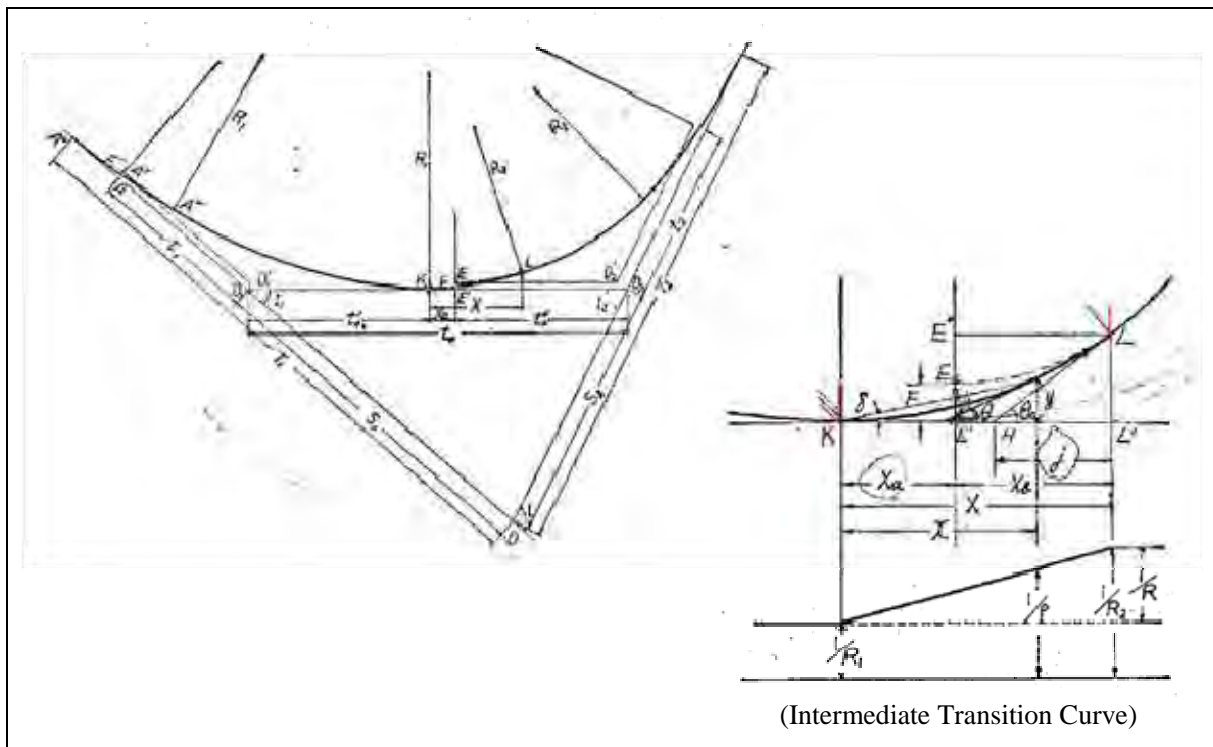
The Example of Horizontal Alignment Improvement Plan (1)
